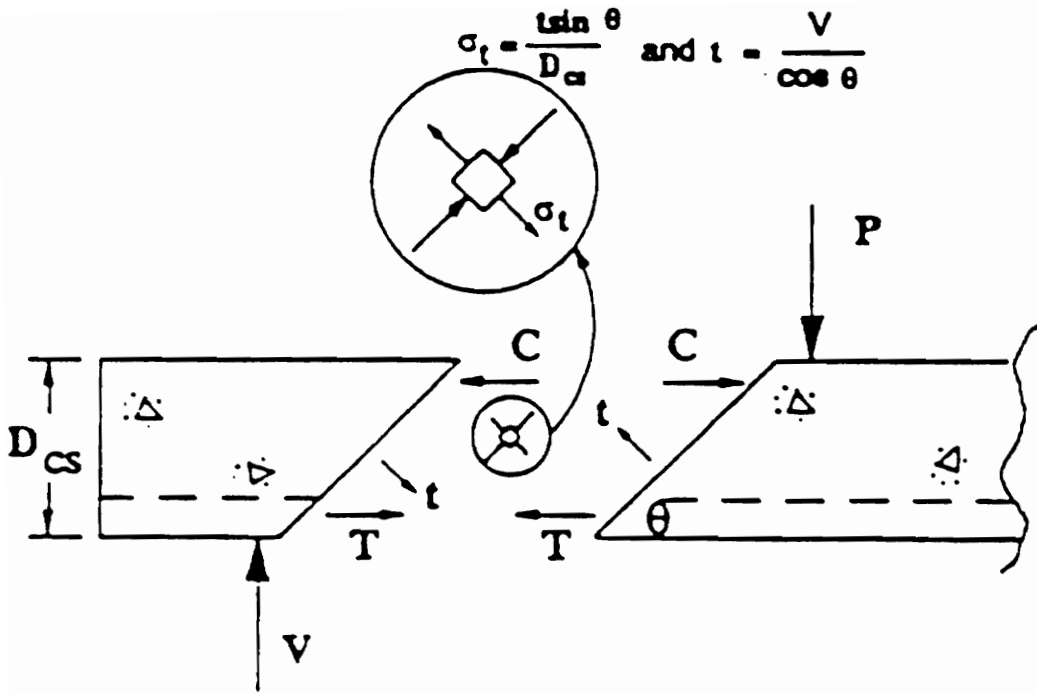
Assumed State of Equilibrium Just Prior to Diagonal Cracking (Patrick and Bridge 1992)
